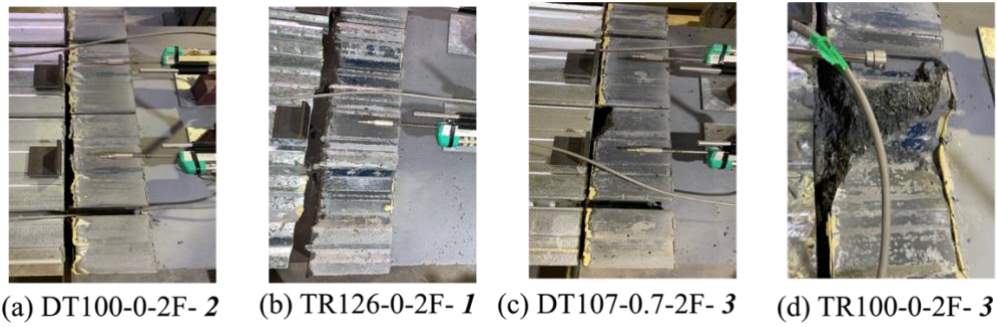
Typical failures of specimens without fibres (a)DT (b)TR where cracking did not occur, and (c)DT (d)TR where cracking did occur.
